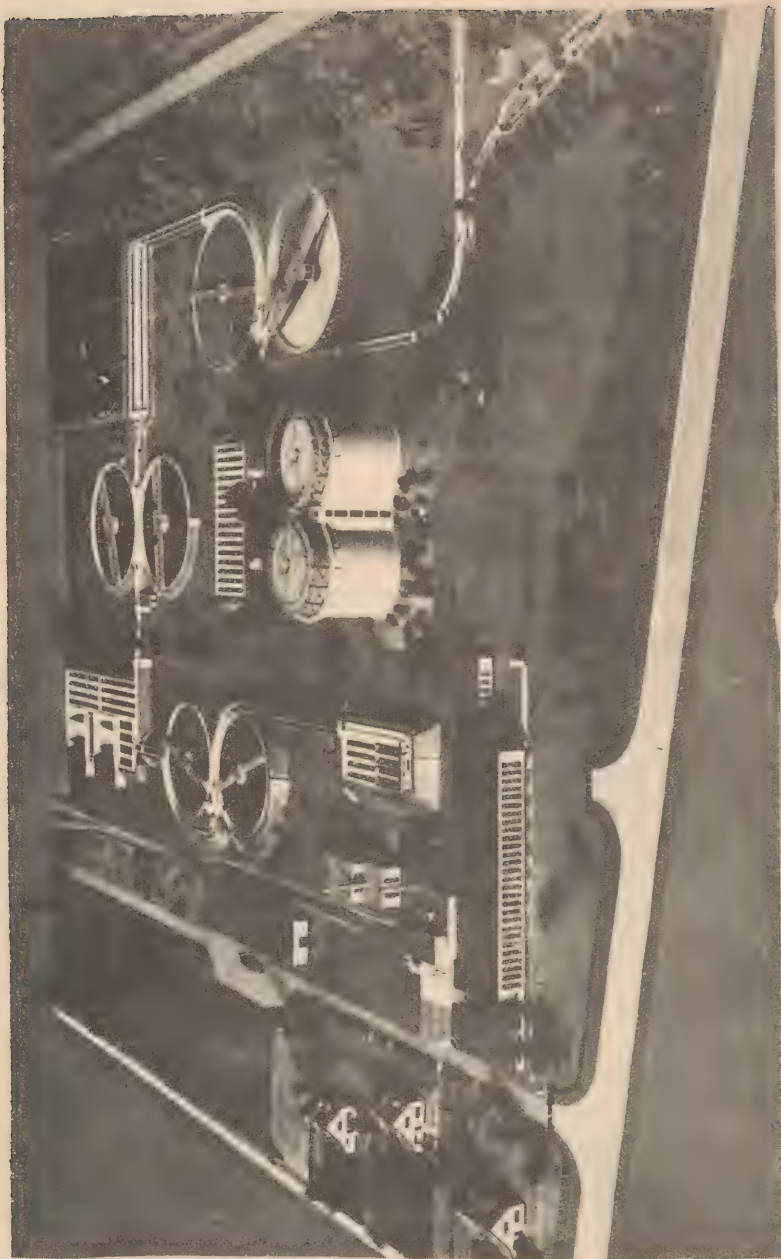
d, Niers District Plant No.1. Model General Plan
